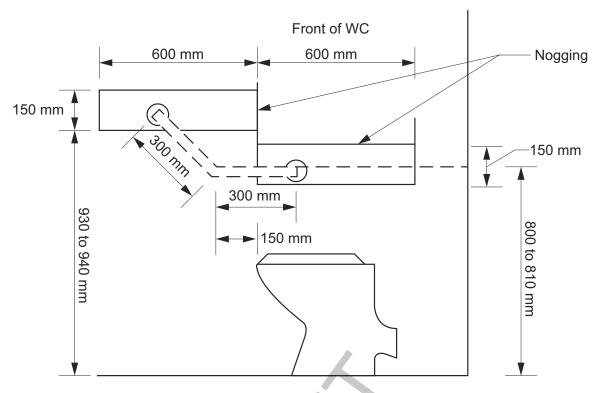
Location of sheeting for wall adjacent to a toilet pan
